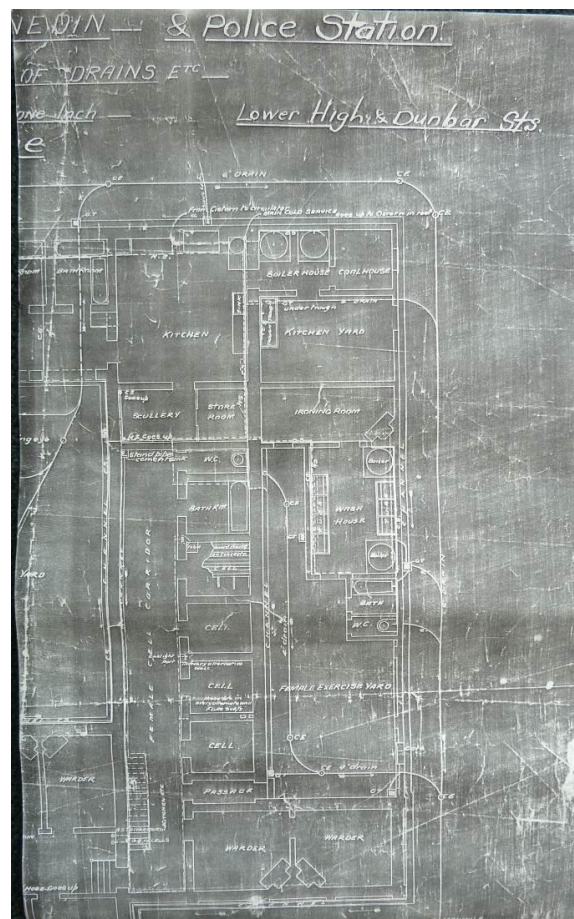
Part of an early (C1916) but undated drainage plan for the ground floor of the Dunedin Prison and Police Station. This is the earliest plan of the building so far located and shows the uses of ground floor spaces, possibly after the prison also housed the Dunedin Police Station but it could also be part of a plan that originally included the adjacent Police Station / Barracks. Surprisingly, the whole plan of the ground floor does not show the addition in the northeast corner constructed by 1902 as a separate entrance for gaolers. (DPCT)
